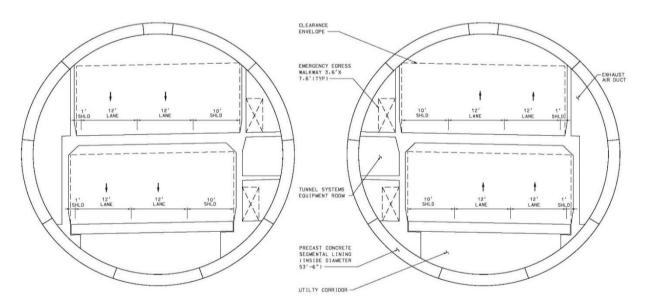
Freeway Twin-Bore Tunnel Cross Section
